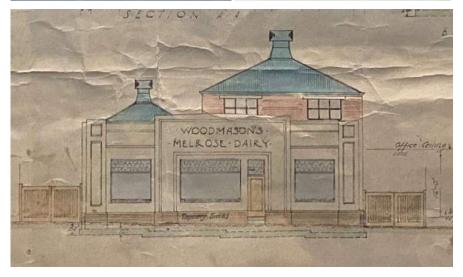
Design for a new dairy building by architect H Stanley Harris, 1934 (SHC Ref No 11920)
